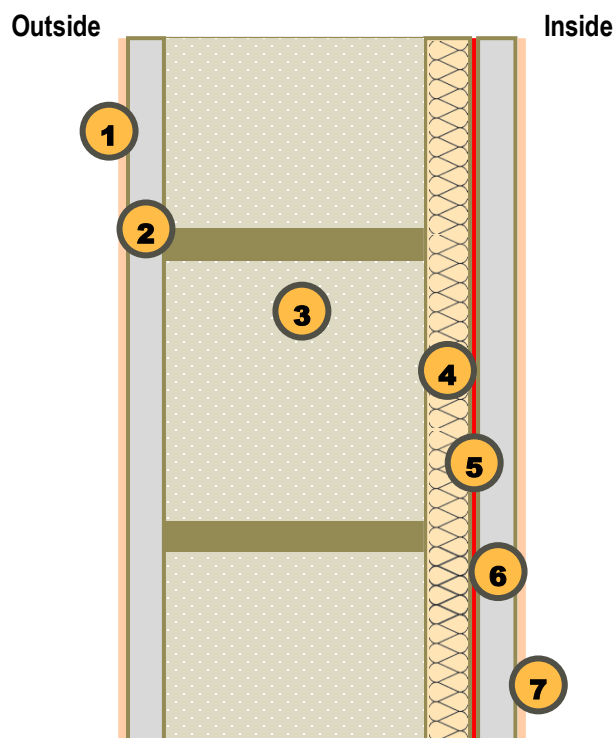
Construction detail for wall assembly: AAC block with rigid board insulation on the inside
